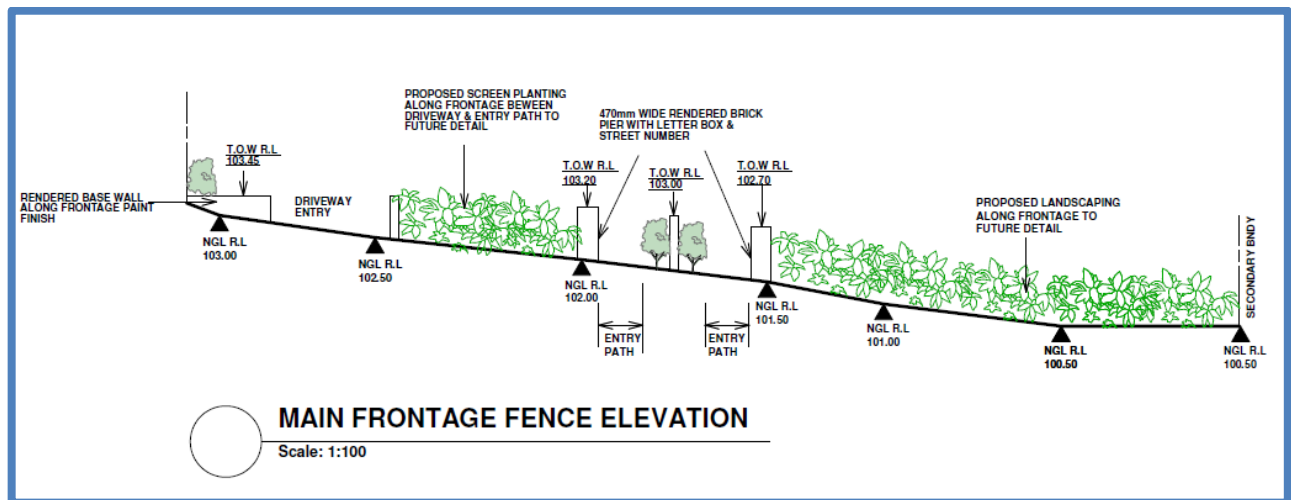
Proposed main frontage fence elevation to Ferguson Street
